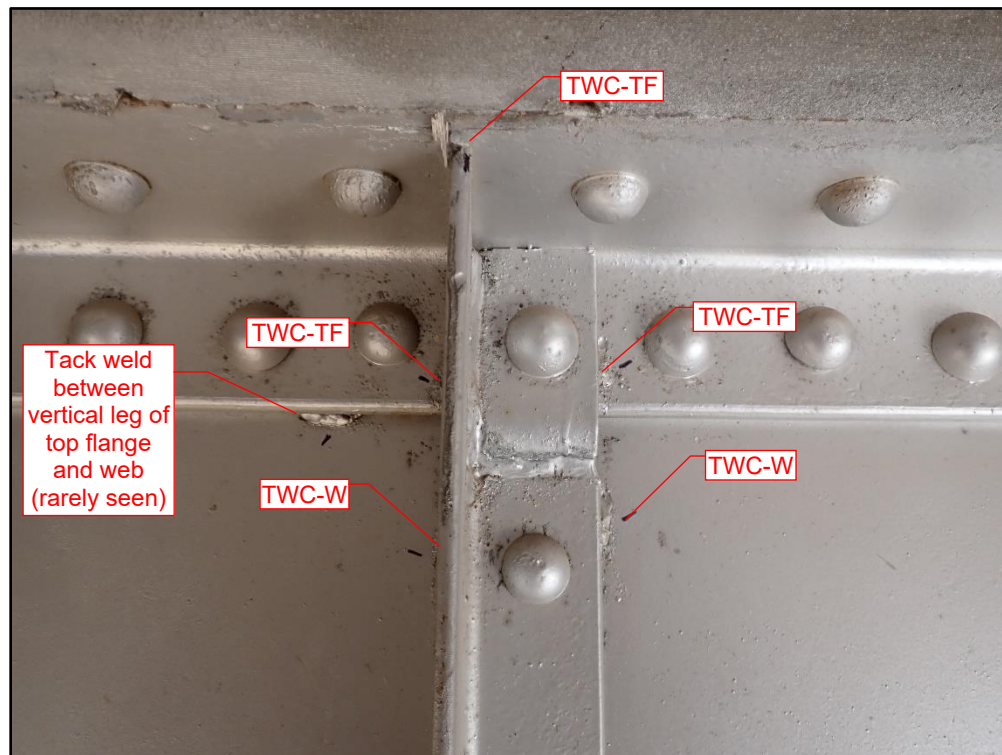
Typical Stiffener Tack Weld Configuration with Crack Code Call-Outs
